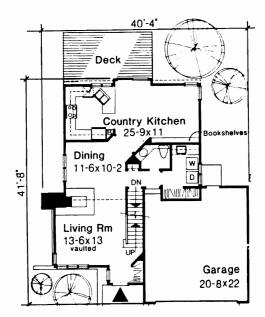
Plan with Open Unit Plan Style in North America (Source: Galinghouse, 1997)
